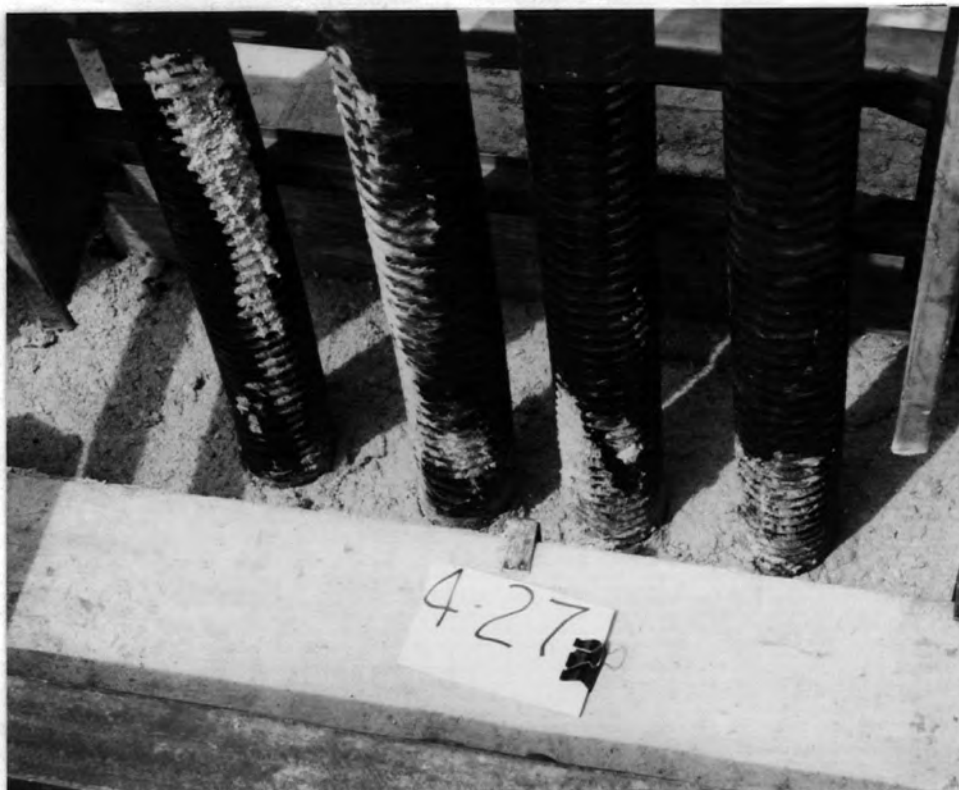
UNEXPOSED SURFACE OF SEAL
